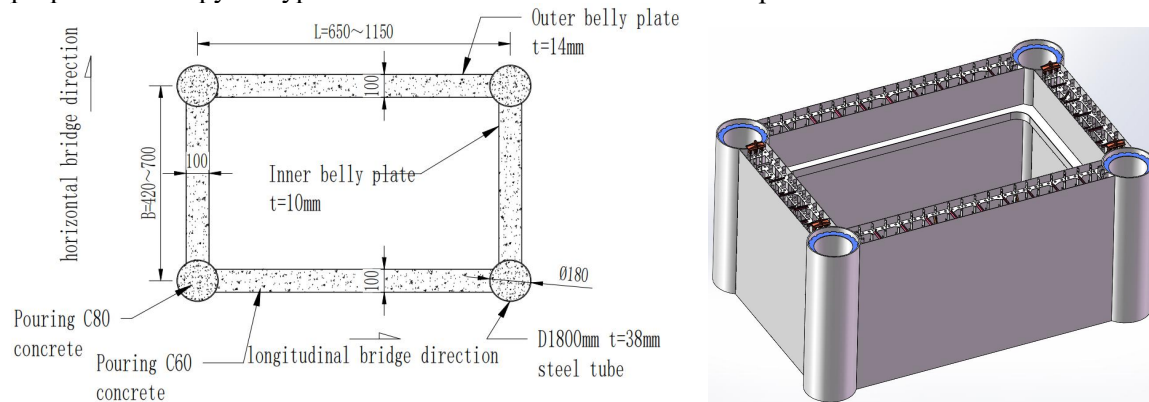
Steel Tube/Steel Box-Concrete Composite Structure Pylon
